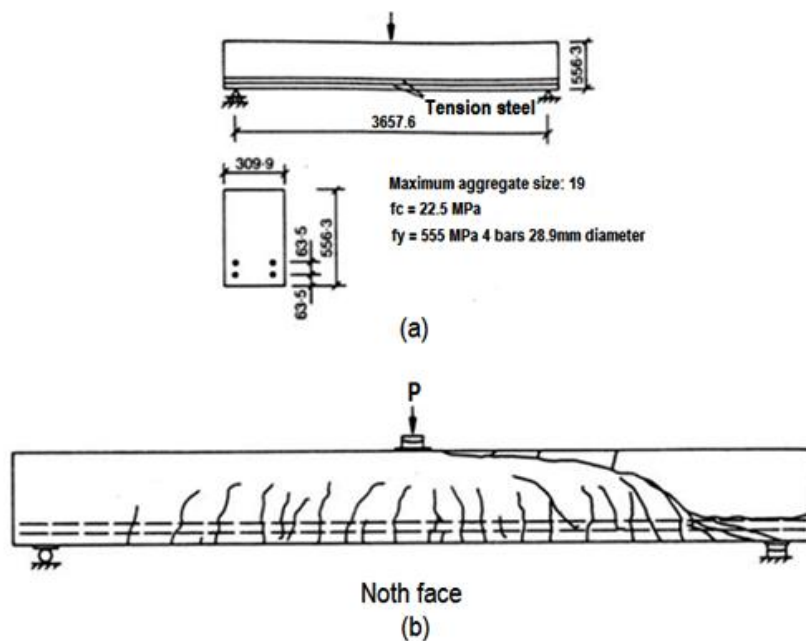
RC BEAM WITHOUT STIRRUPS UNDER CENTRAL POINT LOAD. (A) MEMBER CHARACTERISTICS, (B) EXPERIMENTALLY OBSERVED CRACK PATTERN AT ULTIMATE LOAD^[186].
